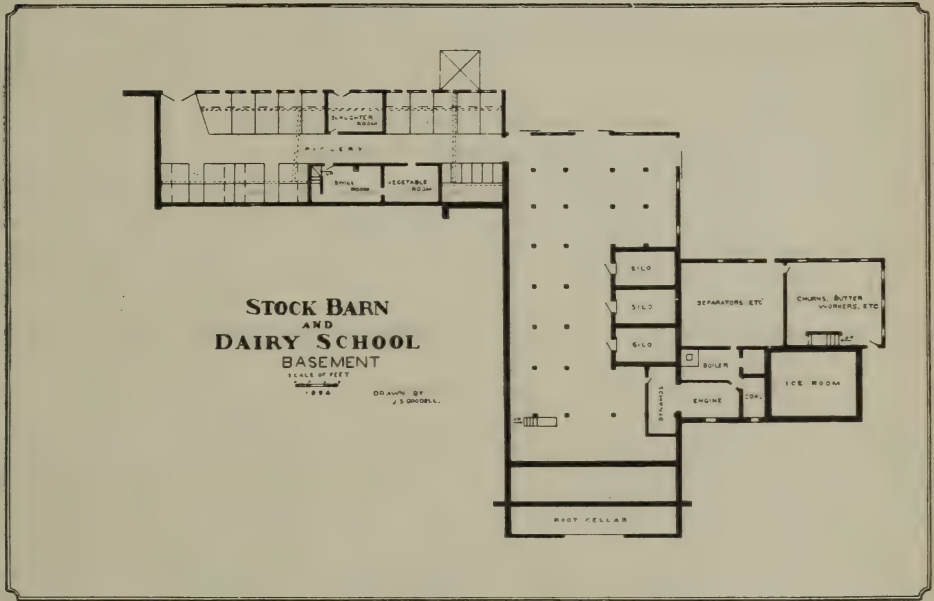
Ground plan of Massachusetts College stock barn—basement.
